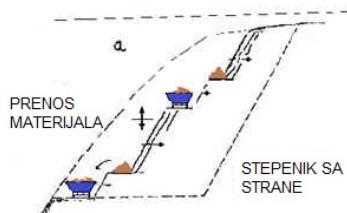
Excavation of side cuts, with cross or longitudinal transport of dredged material
